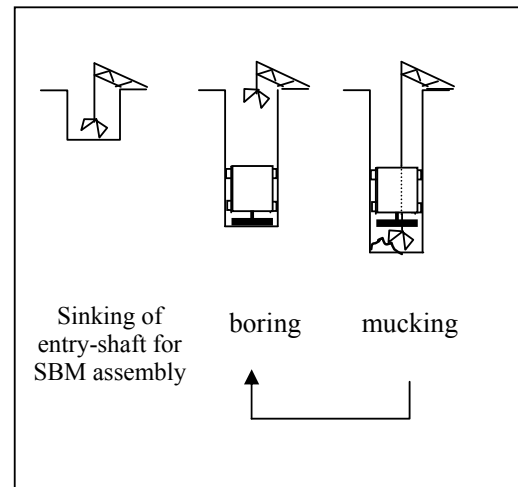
Shaft sinking with a shaft boring machine and mucking
